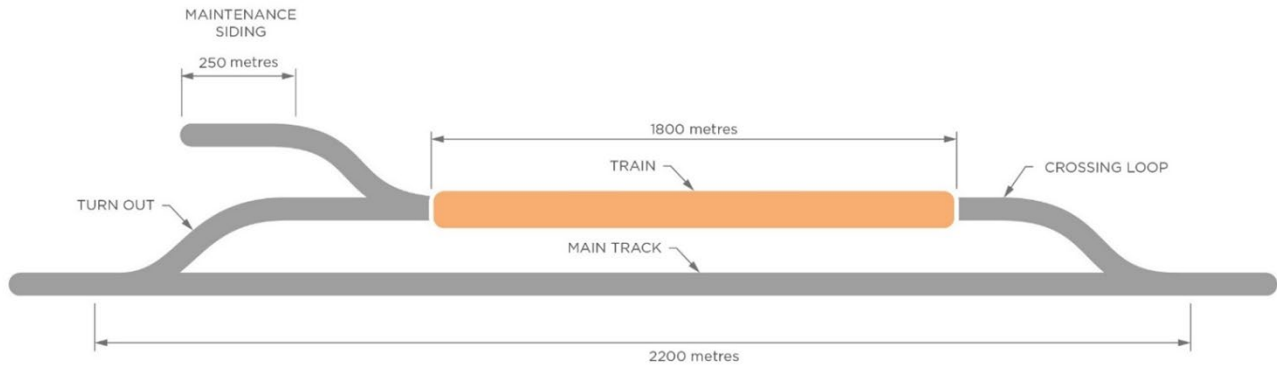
TYPICAL LAYOUT OF A CROSSING LOOP
